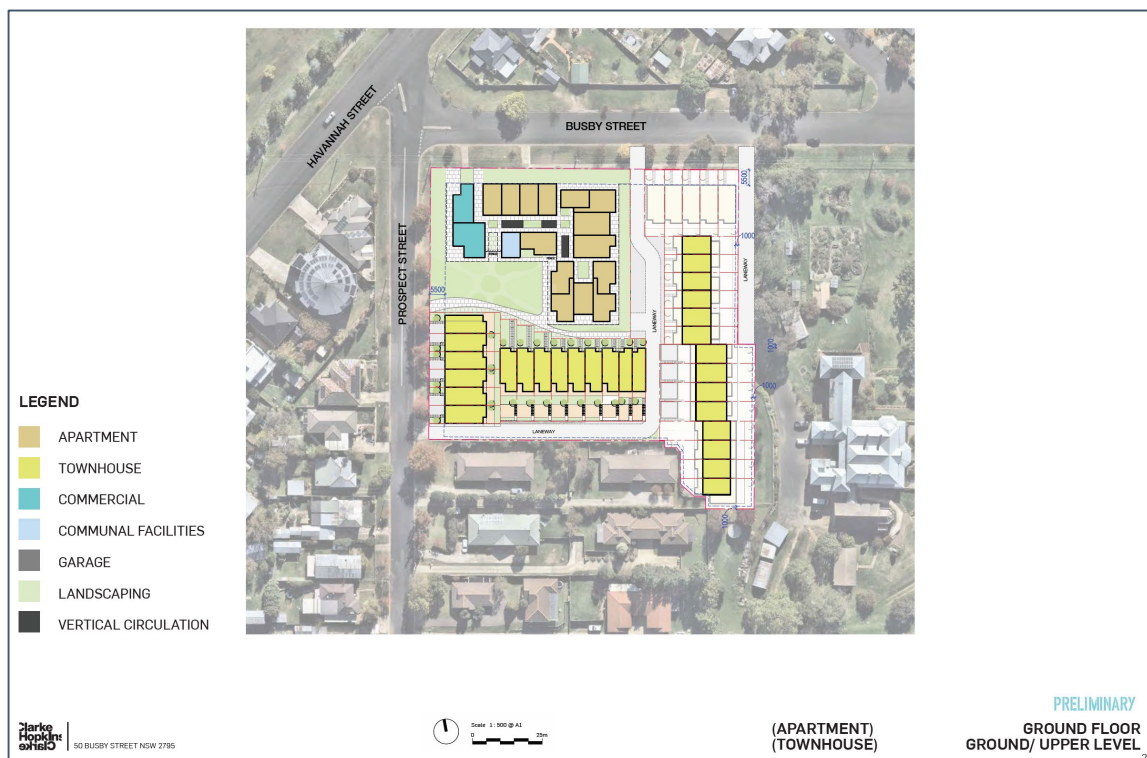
Proposed ground/upper ground floor plan – 50 Busby Street (Source: Clarke Hopkins Clarke)
